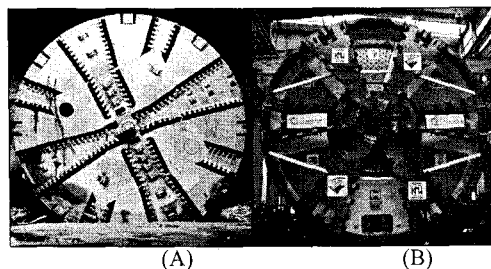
Cutterhead types for slurry machines (A) closed (B) open.
